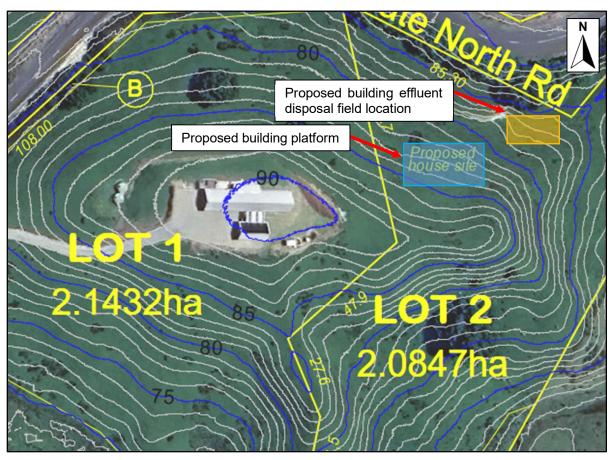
Proposed subdivision plan (Williams and King Ltd).
